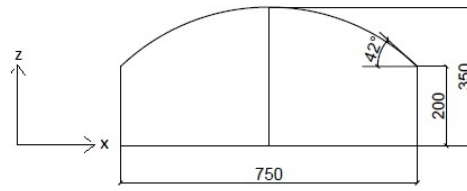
Section drawing of the cylindrical roof shape with dimensions
